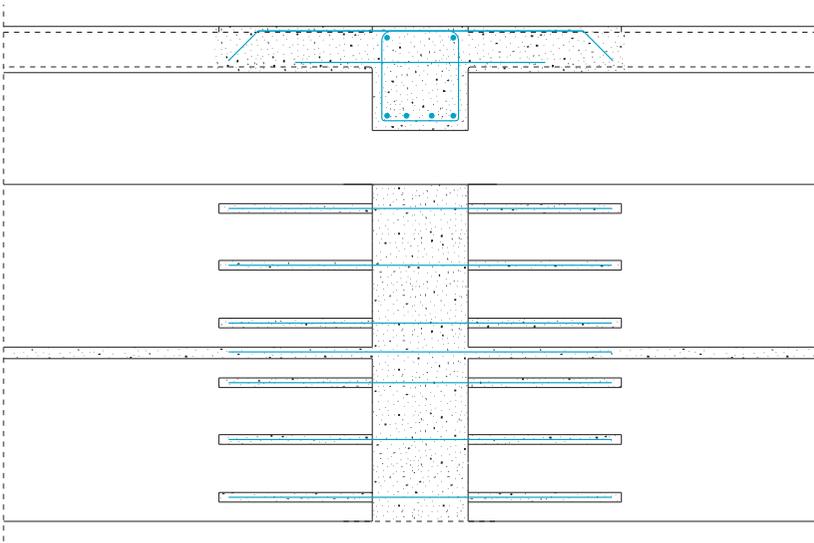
Continuity reinforcing bars are provided with a distance between centres which on the average is not more than 30 - 40 cm.
